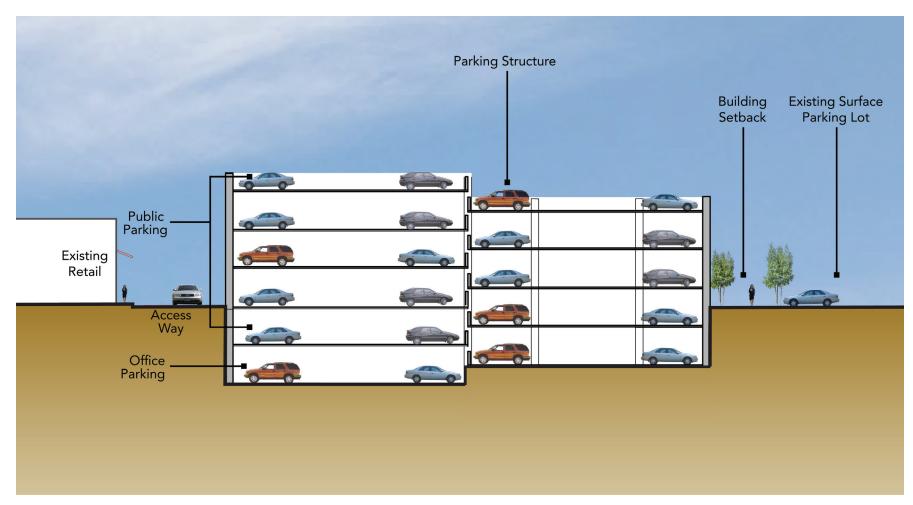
Public-Private Test Case B—Cross-Section of Stand-Alone Parking Structure, Parking Plaza 2 Shown
